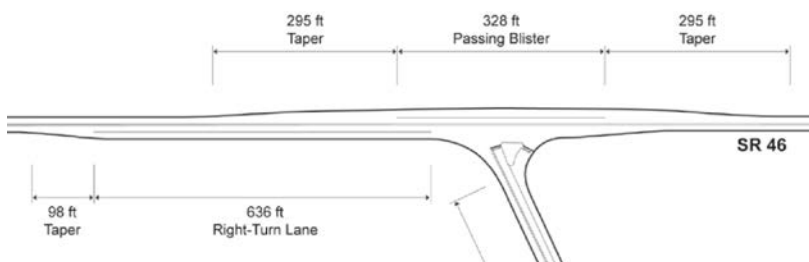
Plan View of Typical Intersection with Shoulder Bypass Lane (25).
